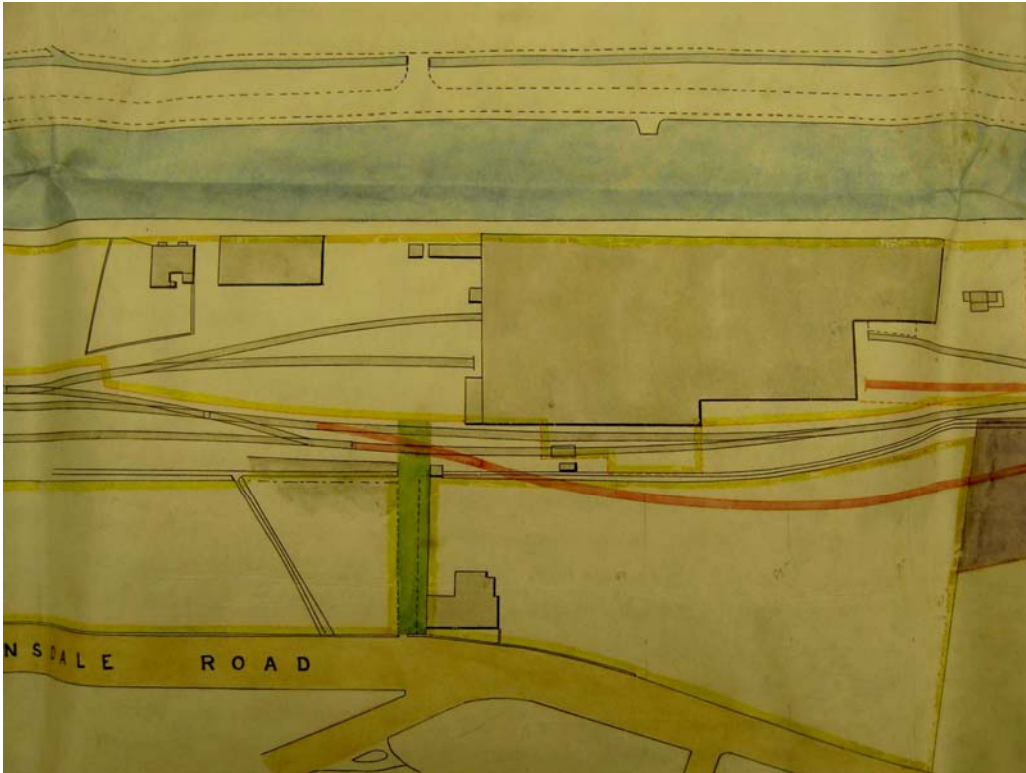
Plan of the house (left) and paper mills from 1898 (BSUD/U/C Box 4/10 1898)
